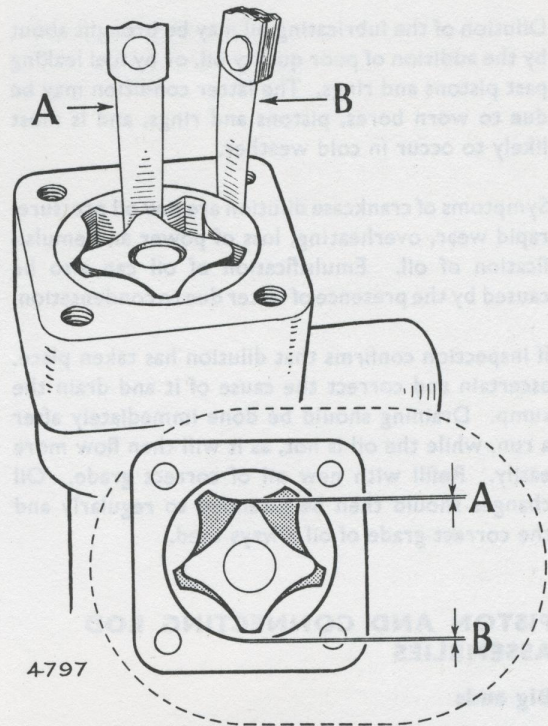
Checking rotor lip and outer rotor clearance in the pump body
